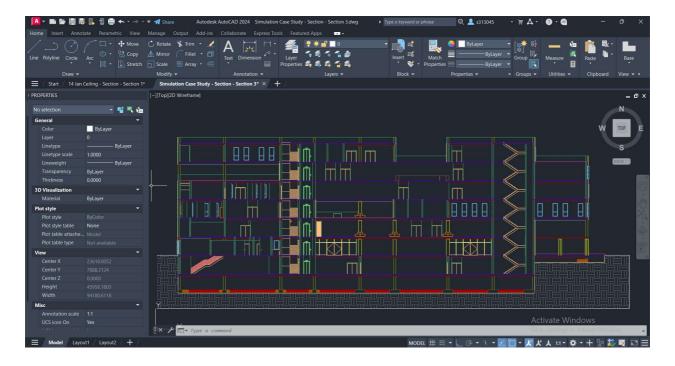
The Section in AutoCAD after editing, Elaborated by Authors
